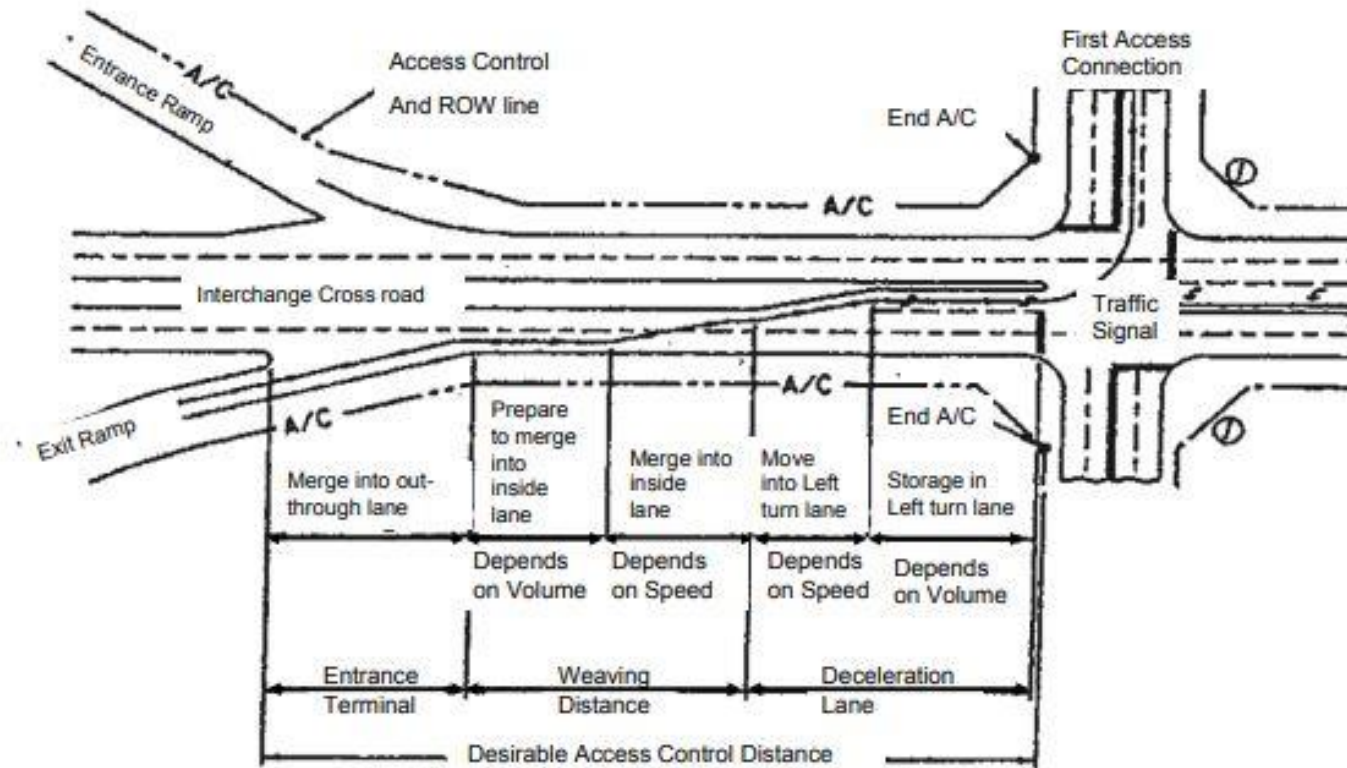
Free Flow Ramps Entering and Exiting From Cross Road
